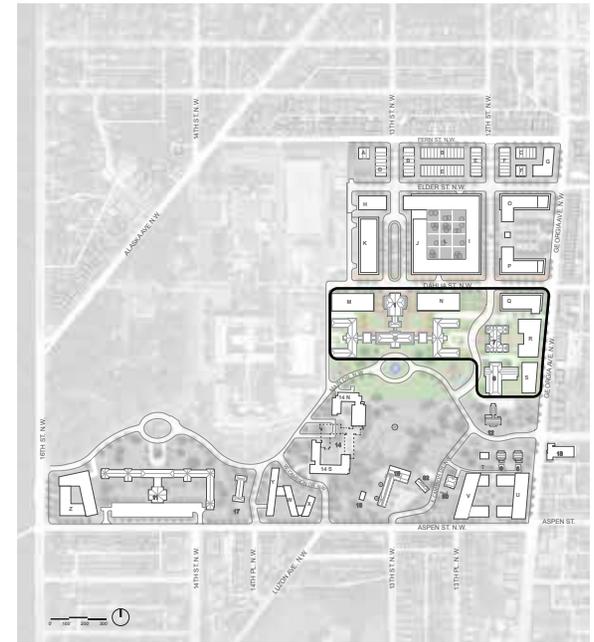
Sub-Area Key Plan 3. Source: Perkins+Will.
